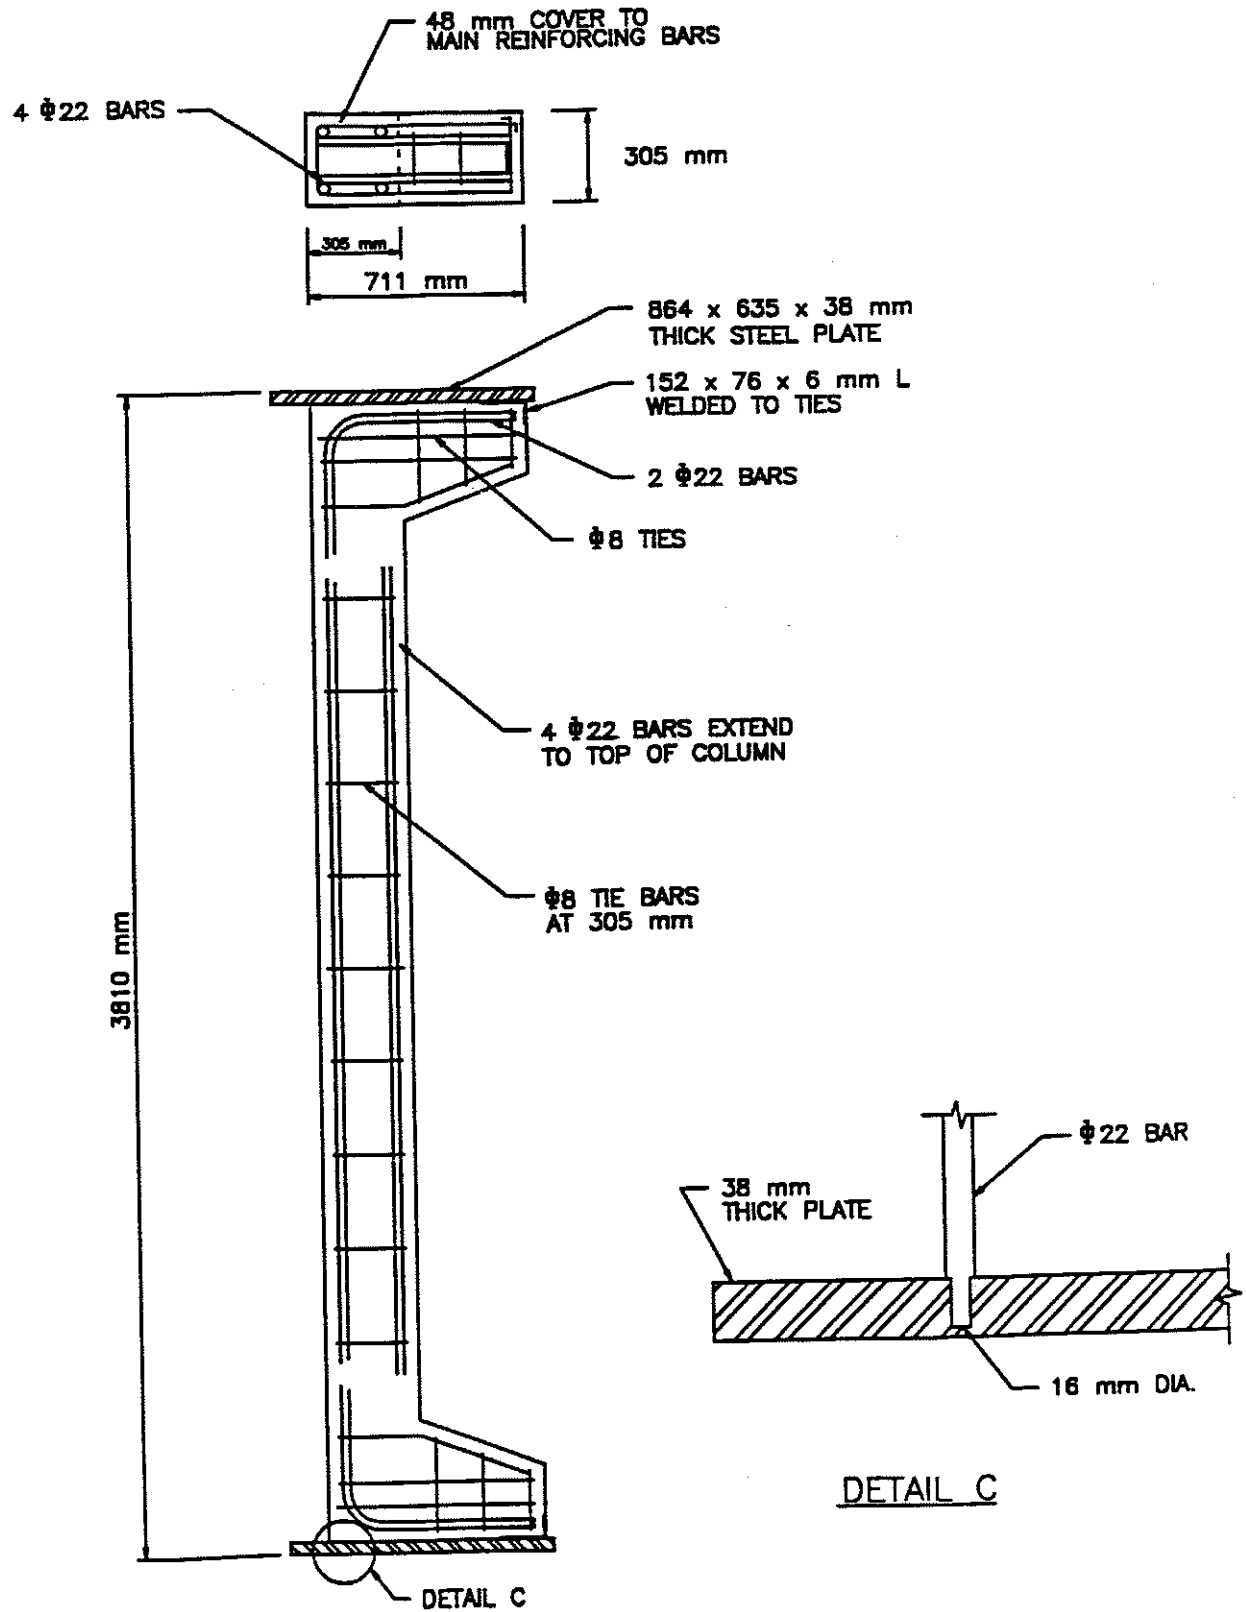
Elevation, Cross-Section and Finishing Detail: Column 2 (TFRI)
